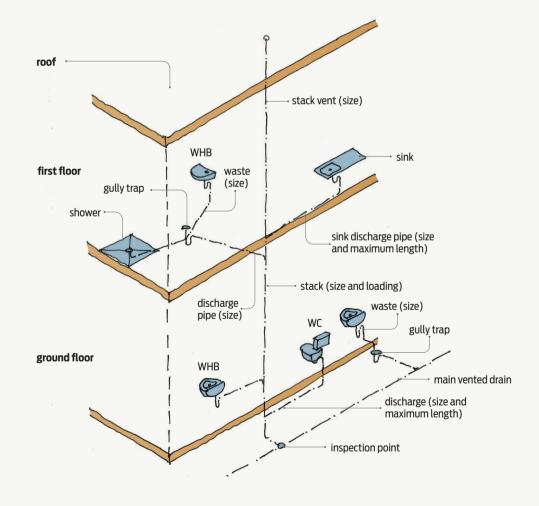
Schematic drawing showing sanitary plumbing vent in a 2-storey house.
